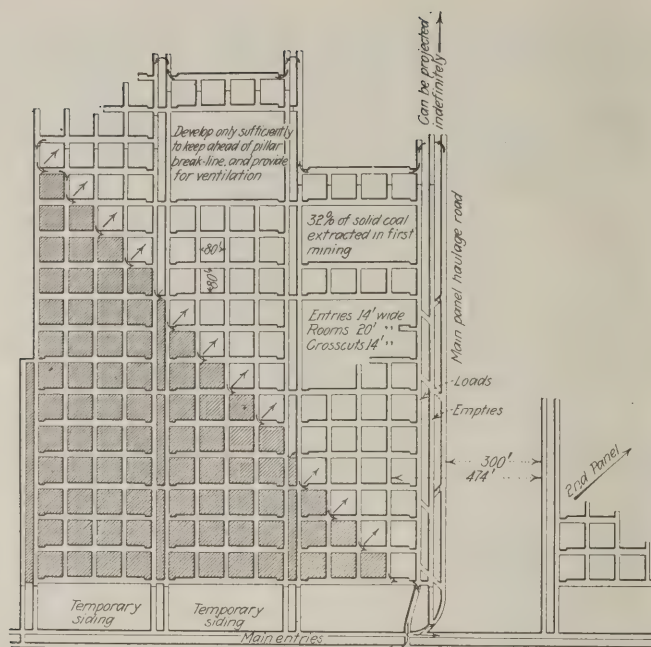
Block System Particularly Adapted to Mechanical Haulage
